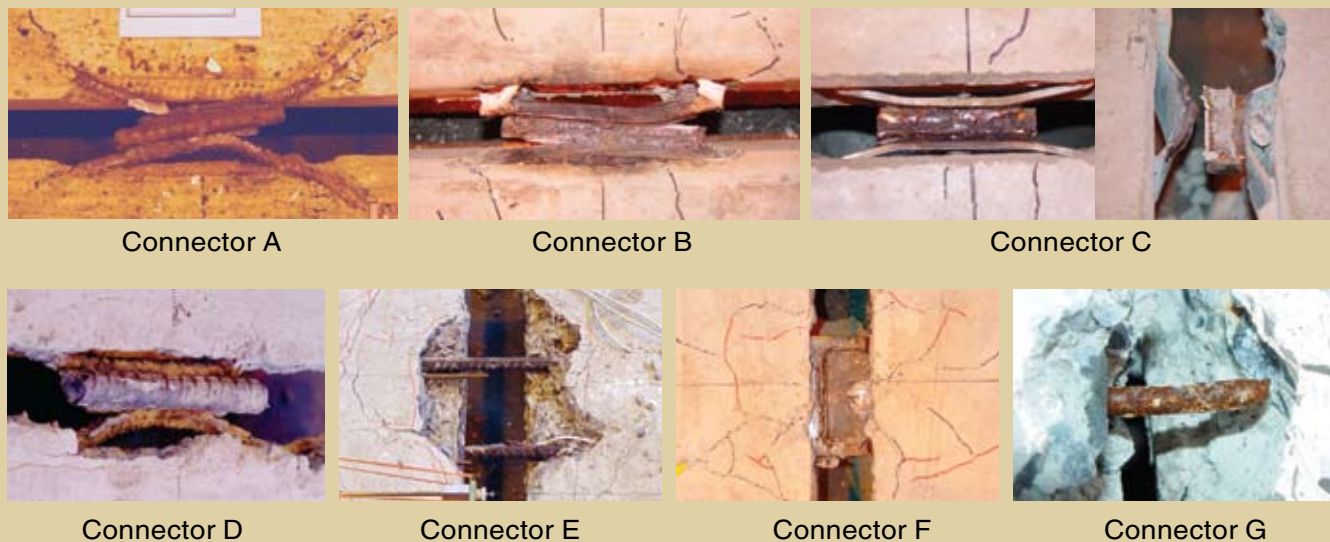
These photos show the damage caused under tension. The connections using field welds tended to initiate tearing at those locations, while the nonwelded connections typically necked and fractured near the joint.
